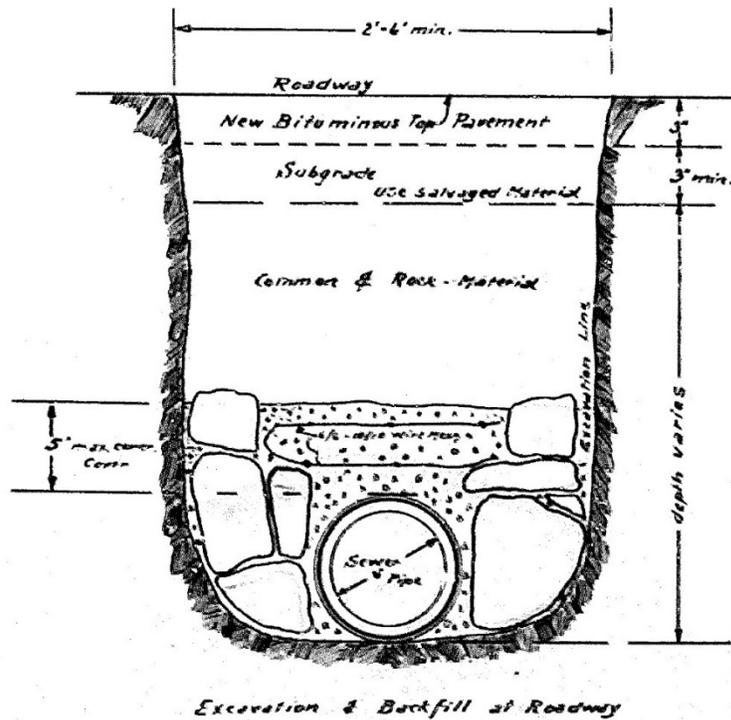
Sewer line construction detail, Drawing No. 113-5710, 1937.
